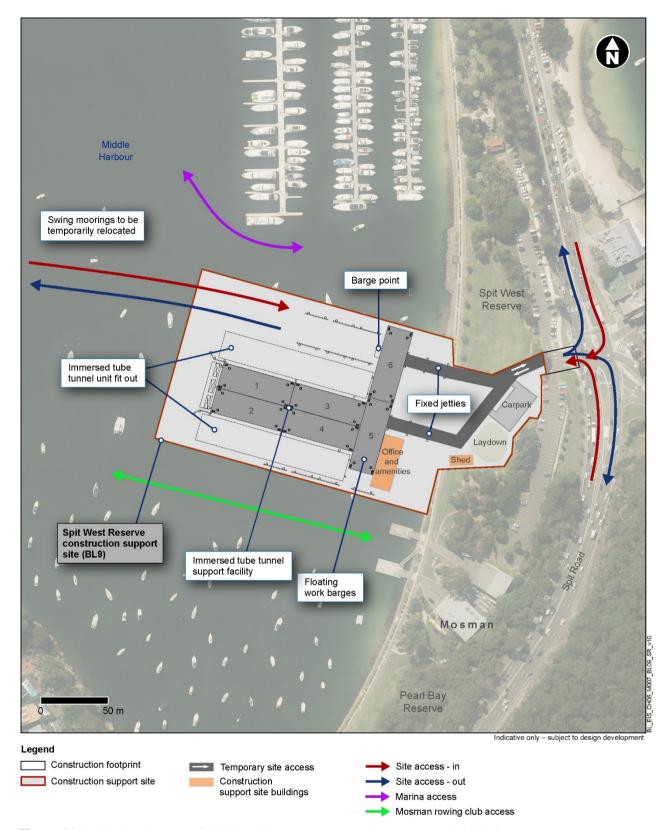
Indicative layout – Spit West Reserve construction support site (BL9)
